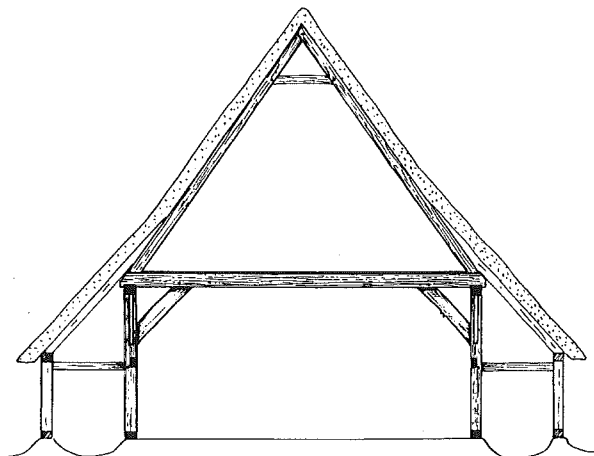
Farm house Smoes (see), cross section of the preserved medieval section from 1468 (d). Cogged roof beams ("aufgekämmte Dachbalken"). The roof is reconstructed from the original rafters, which had been placed on a separate sill in the 18th century. Neither are the side aisles preserved nor is anything known about their original breadth. A reconstruction assuming a construction similar to later ones leads to a section of the roof line with the (safely reconstructable) aisle beams at an aisle breadth of only 1.5 m. This may not be sufficient for stalling cattle in full length in the aisles. Something may have been different from the later way of cattle stalling at that time.
